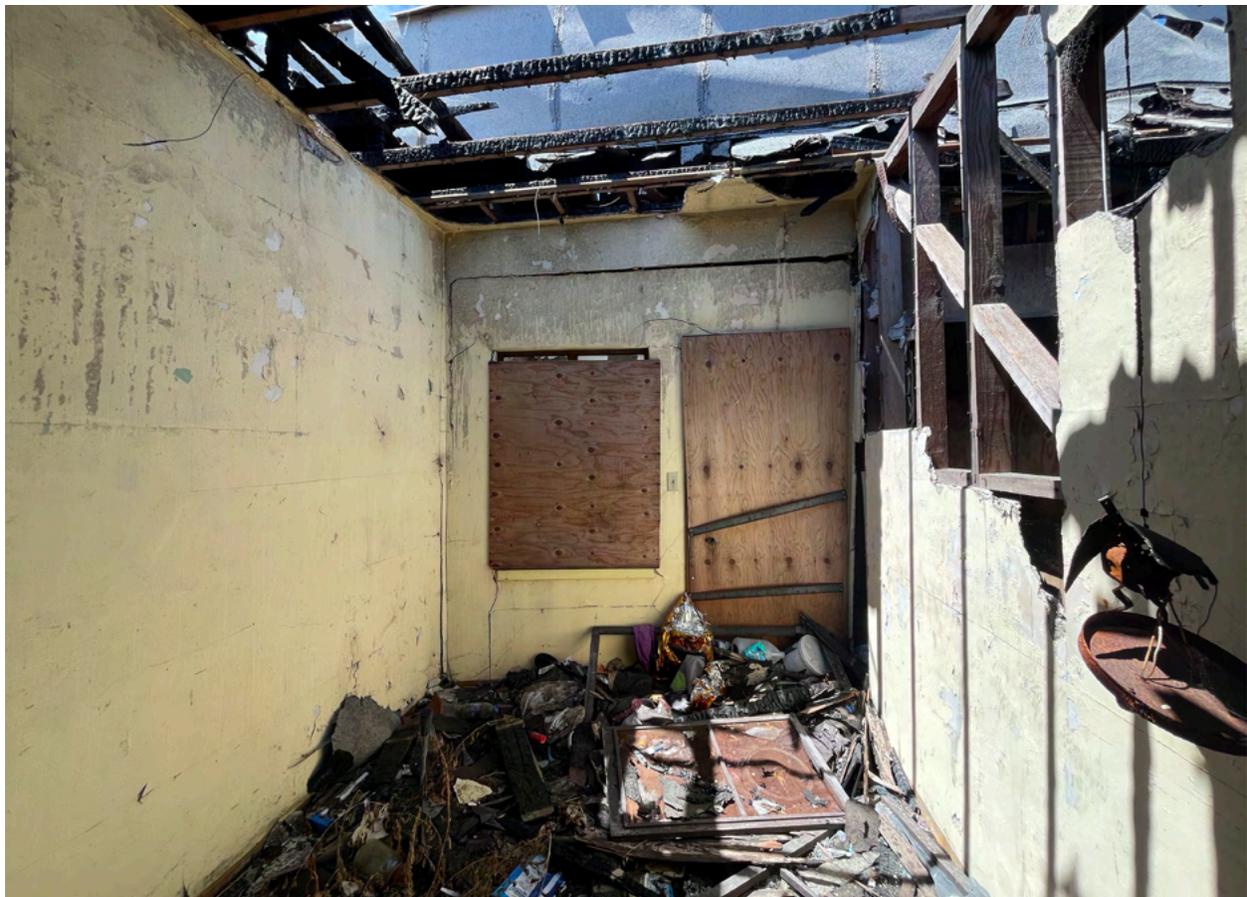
(Top) Second floor hallway, looking east, Groundwork Preservation LLC, 2025.
